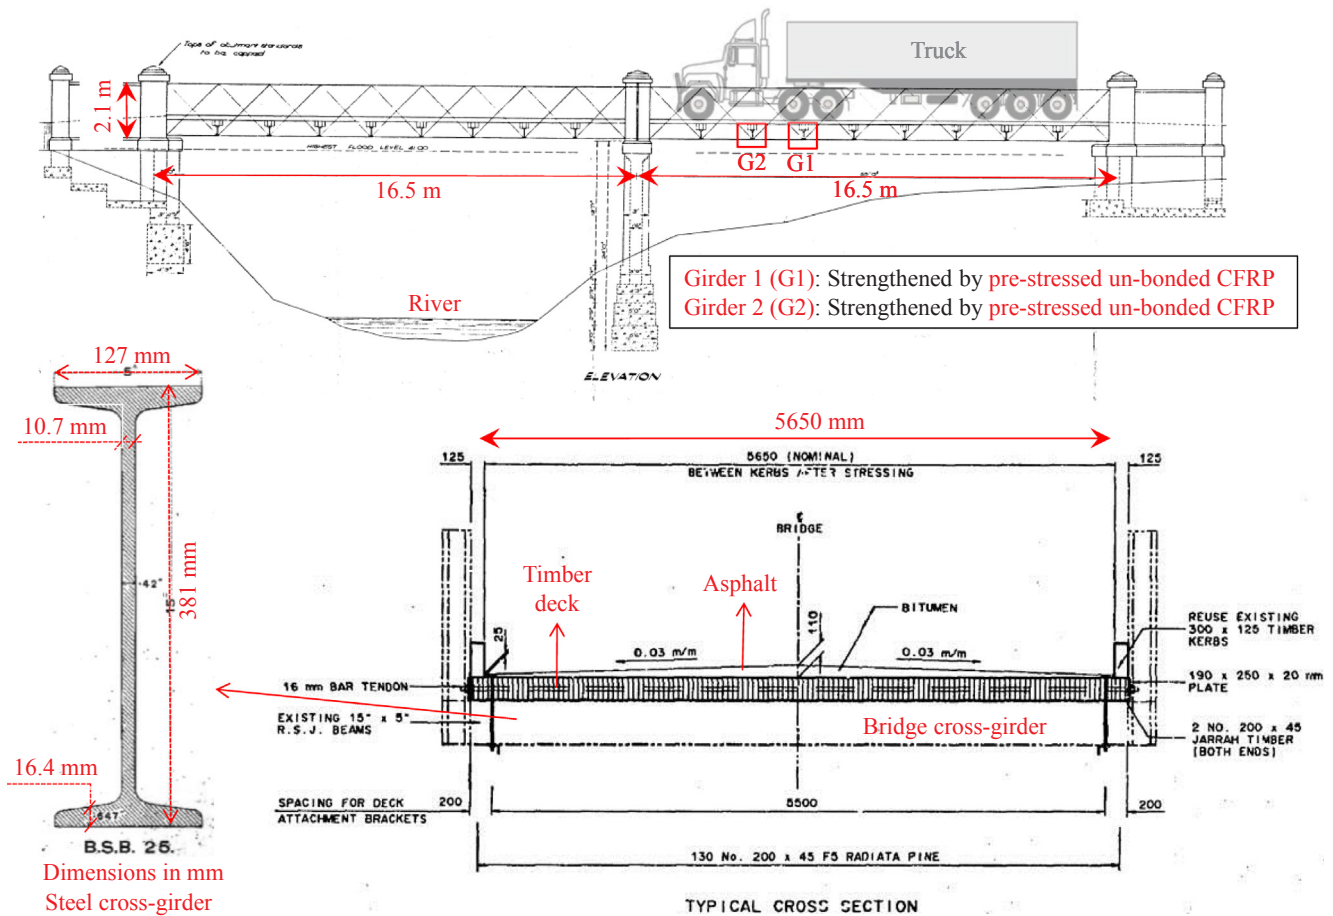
Schematic view of the Diamond Creek Bridge and bridge cross-girders (figures not in the same scale).
